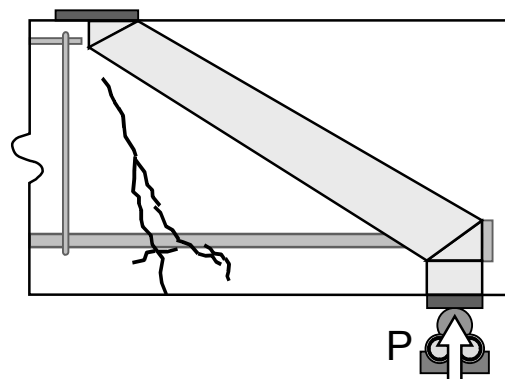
Development of cracks in a shallow strut angle test (CCT-08-30-10.39-1) (continued)
